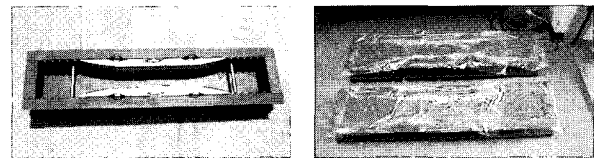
Specimen for drying shrinkage of unrestrained concrete
